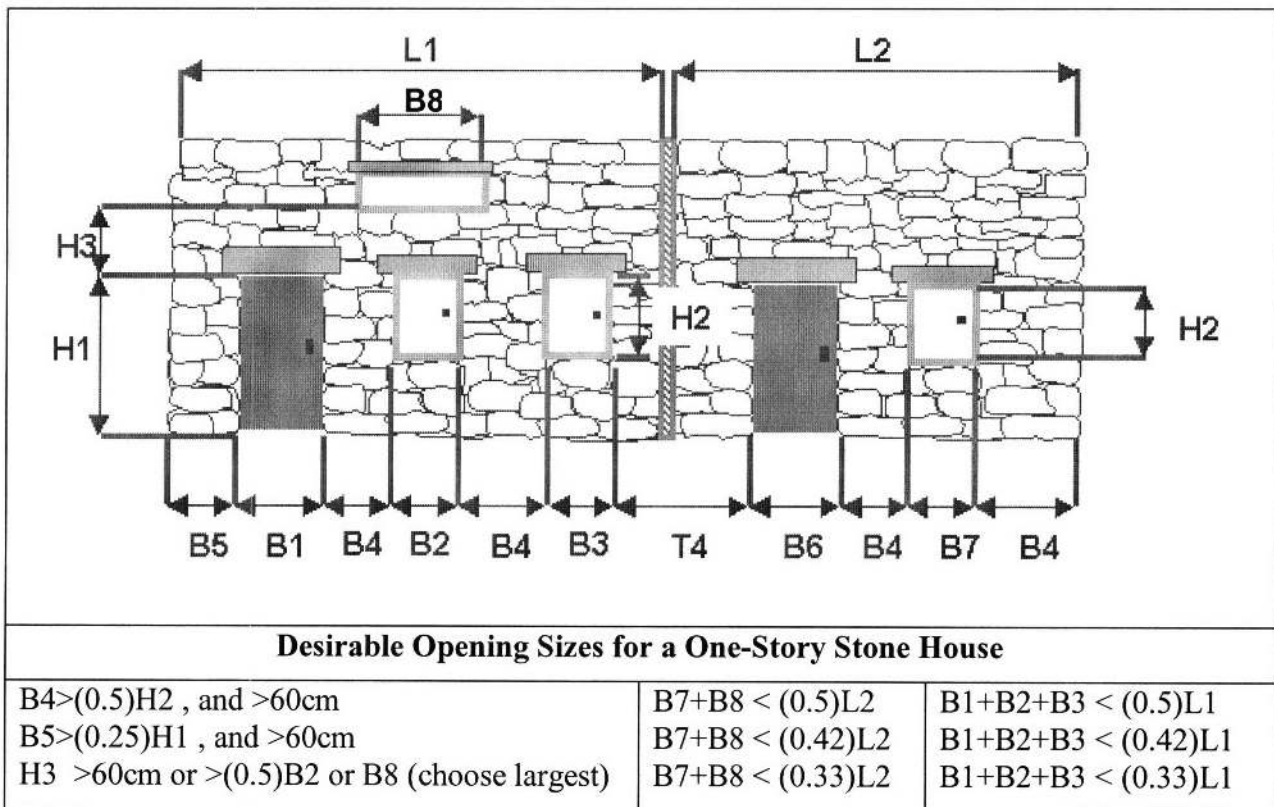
Recommended opening proportions for a one-story, unreinforced stone house (Source: Arya 2005).
